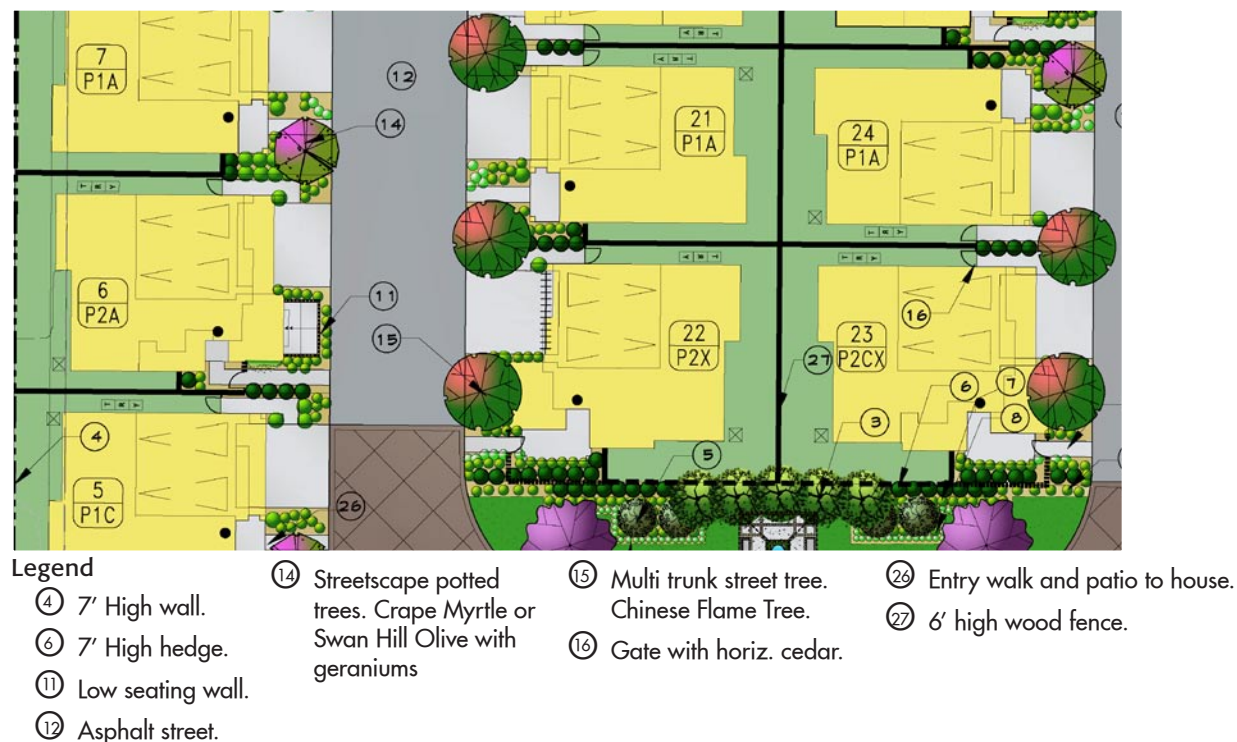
Conceptual Detached Home Landscape Plan
